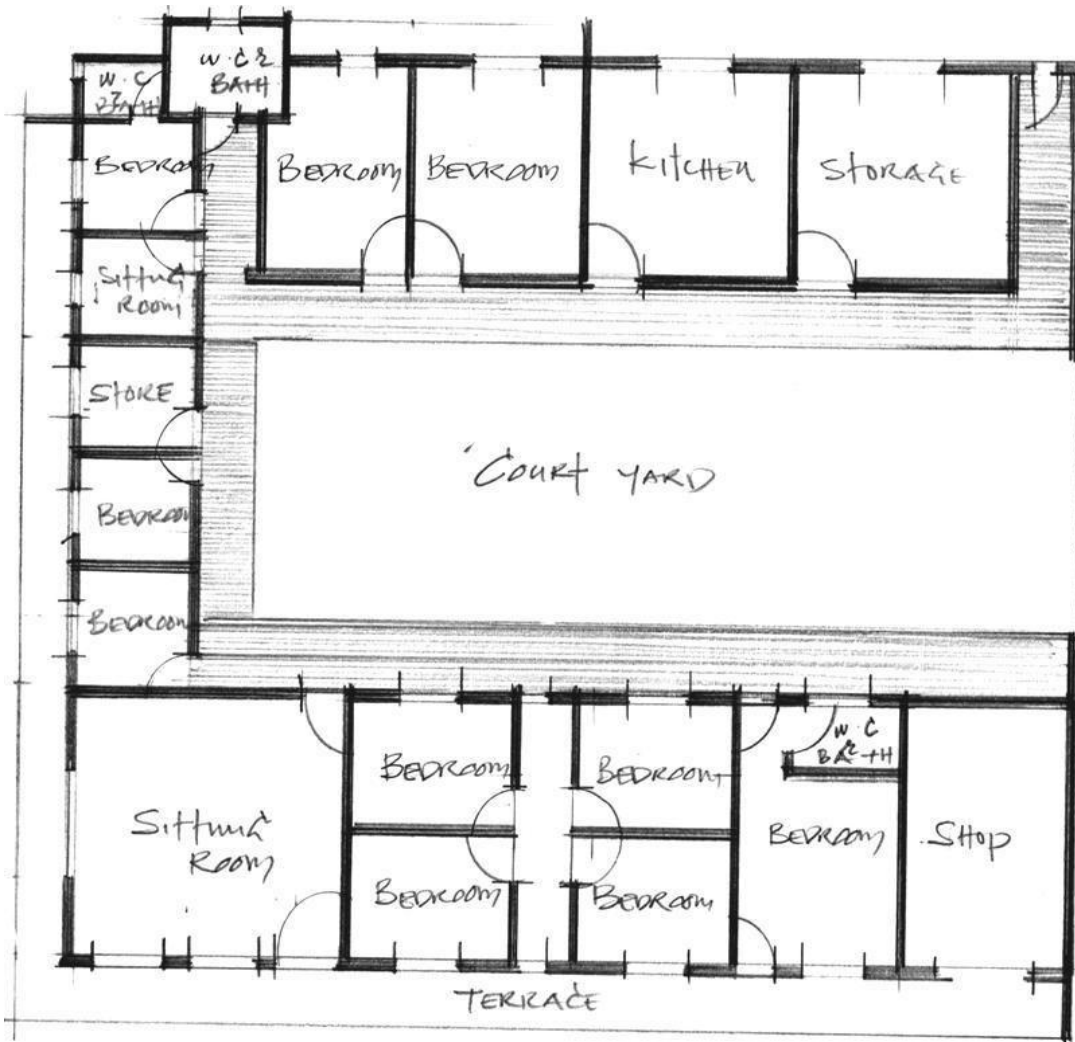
Floor Plan of a Typical Family-Compound Benin House
